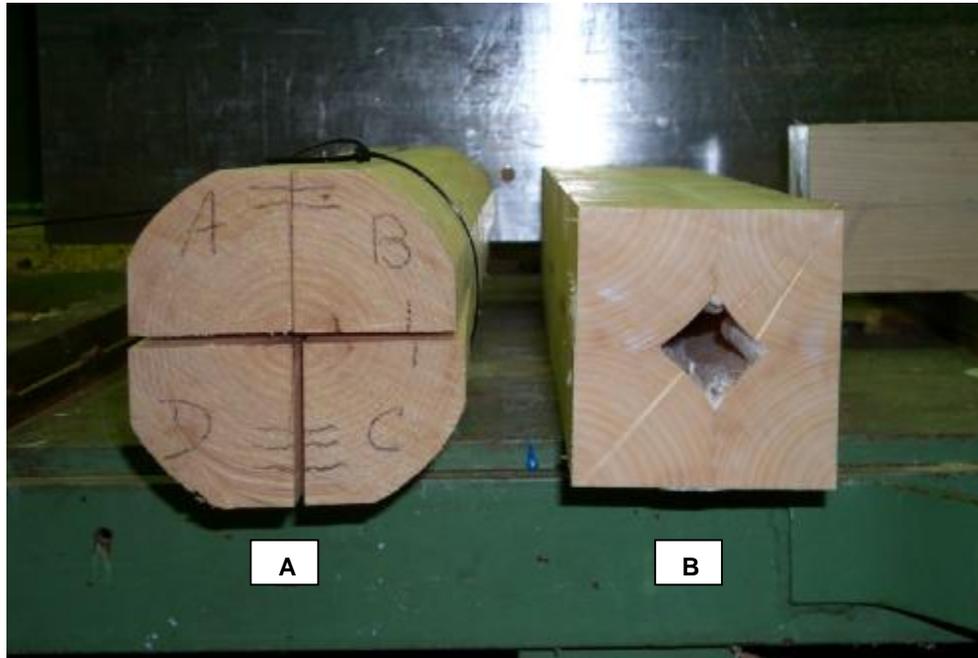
Quarter sections showing machine bonding surfaces prior to reversal (A). Quarter sections reversed, bonded and pressed to construct a re-engineered beam (B).
